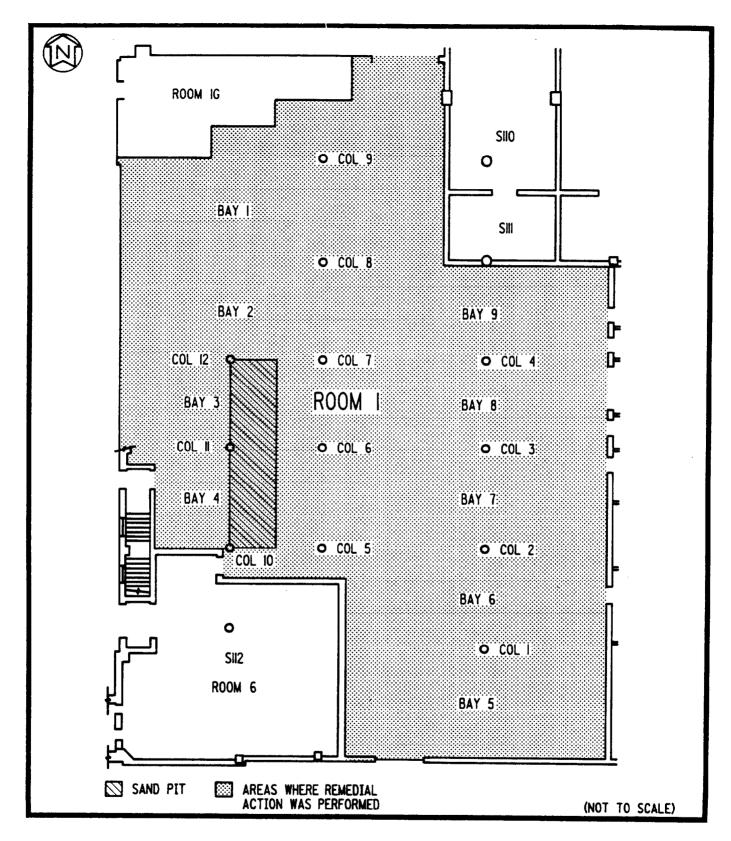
NINE-BAY CEILING IN ROOM 1 ON THE FIRST FLOOR OF THE SOUTH HEADHOUSE
